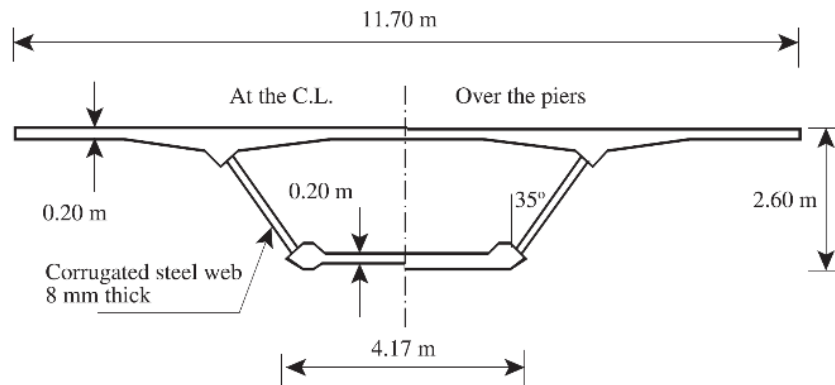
Cross-section of the Cognac Bridge box girder [5] p.658
